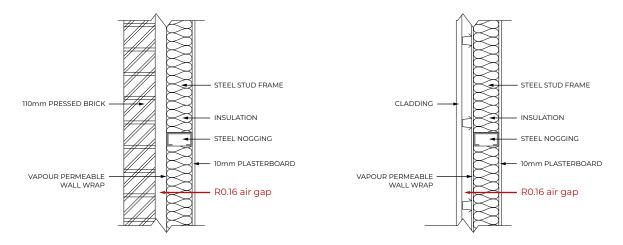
Modelling air gaps in steel framed brick veneer and battened out lightweight clad walls.
